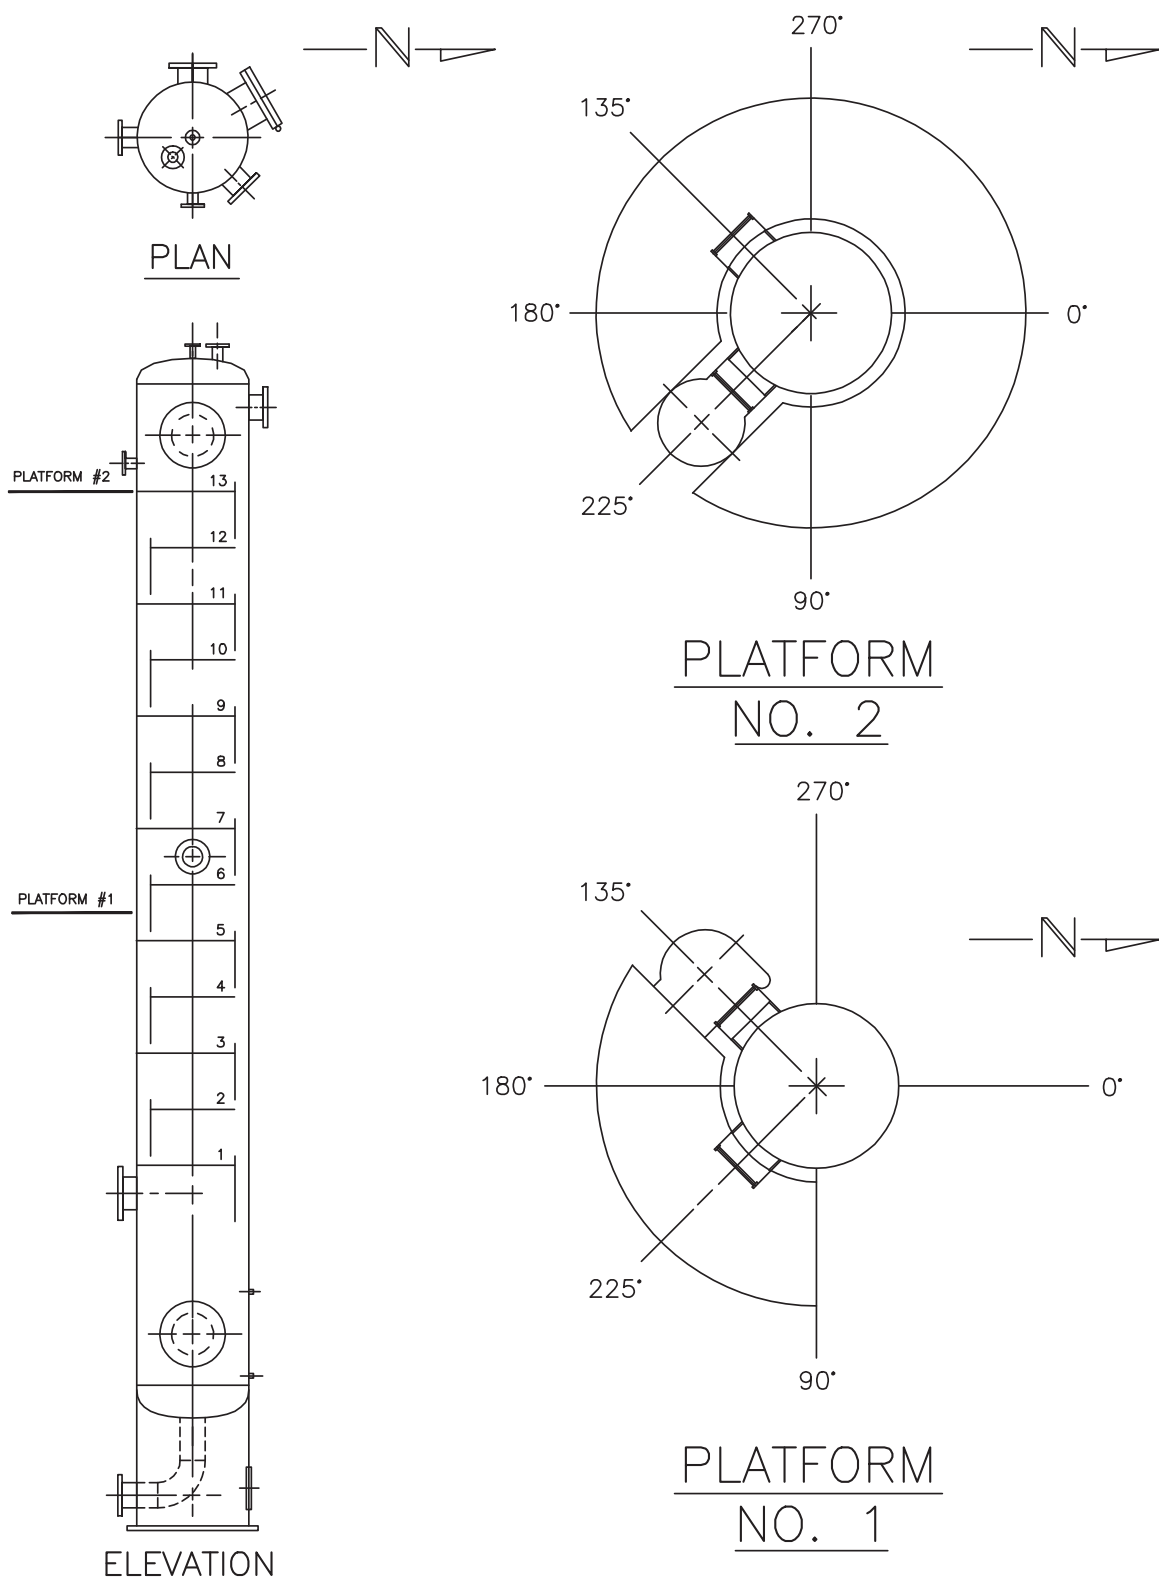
Plan and elevation views of a vertical vessel with platform orientations.
